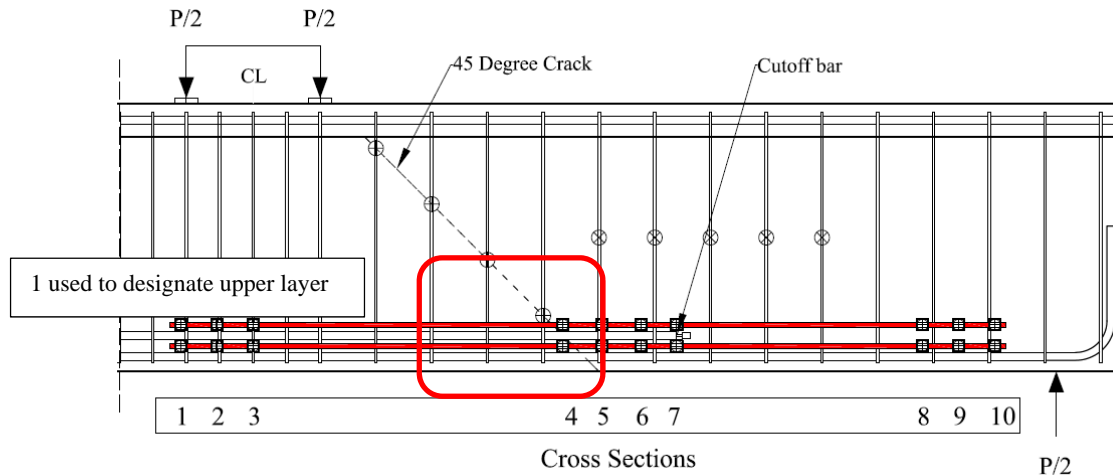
Labeling convention of cross sections in typical T-specimen.
